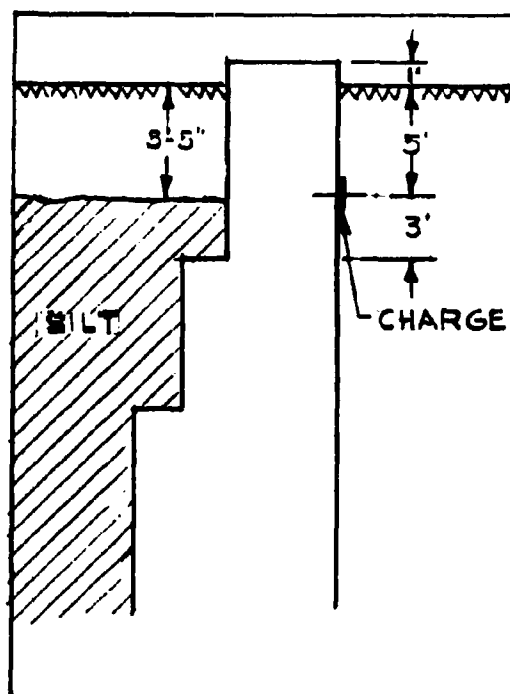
Cross section of lower guide wall showing silt deposit at point of first 30-pound charge. Charge successfully breached wall.
